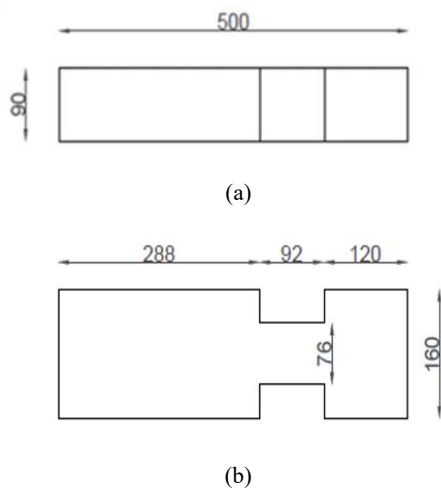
FE-model dimension of standard joint a) top view b) side view
